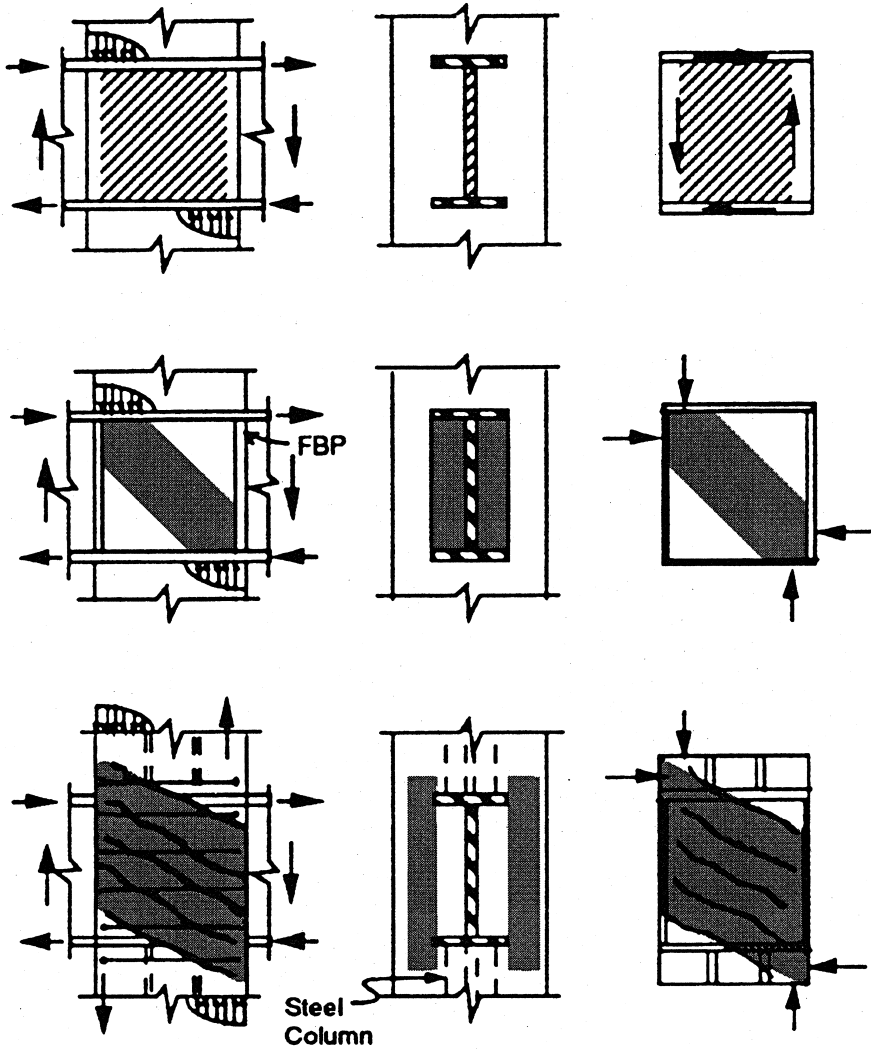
Panel shear mechanisms in steel beam-to-reinforced concrete column connections (Deierlein and others, 1989).
